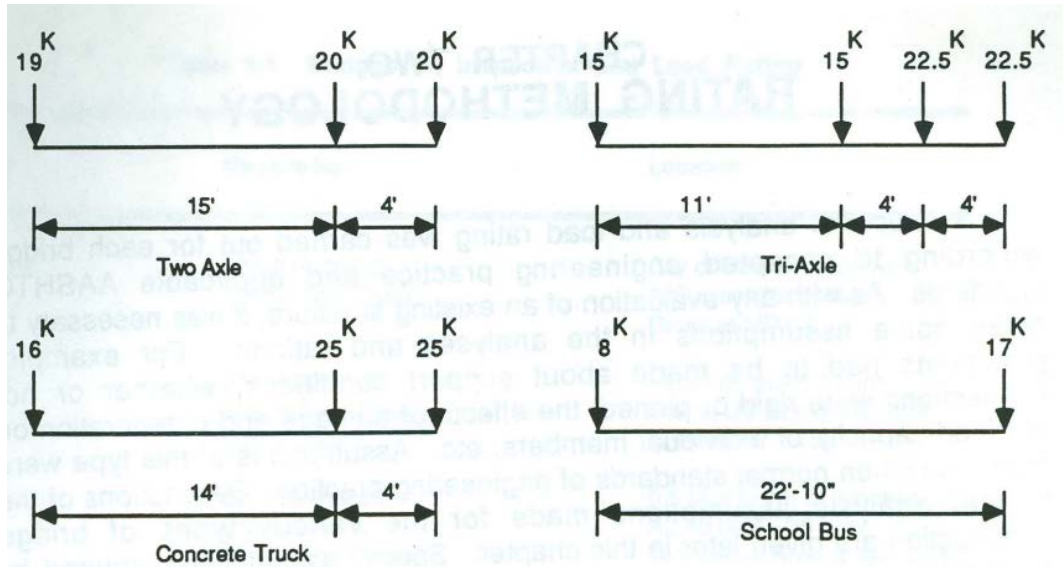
ALDOT Standard Trucks for Two Axle, Tri-Axle, Concrete Truck, and School Bus
